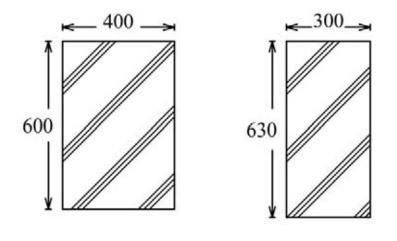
cross-section of columns and beams for RC model, in mini meter
